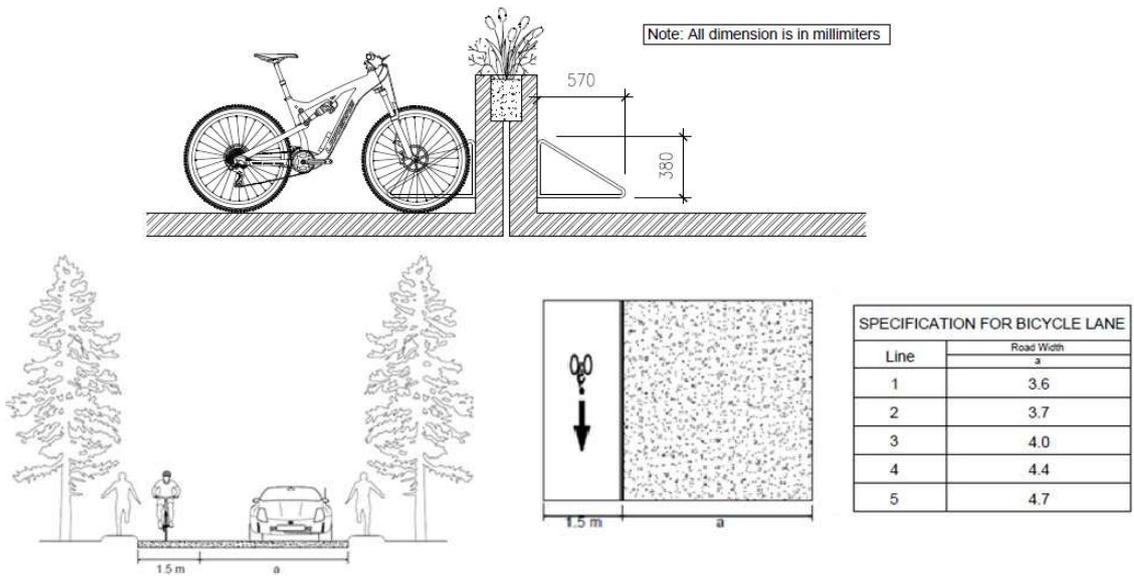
Elevation Plan and Top View for Design of Bicycle Lane (dimensions in meter)
